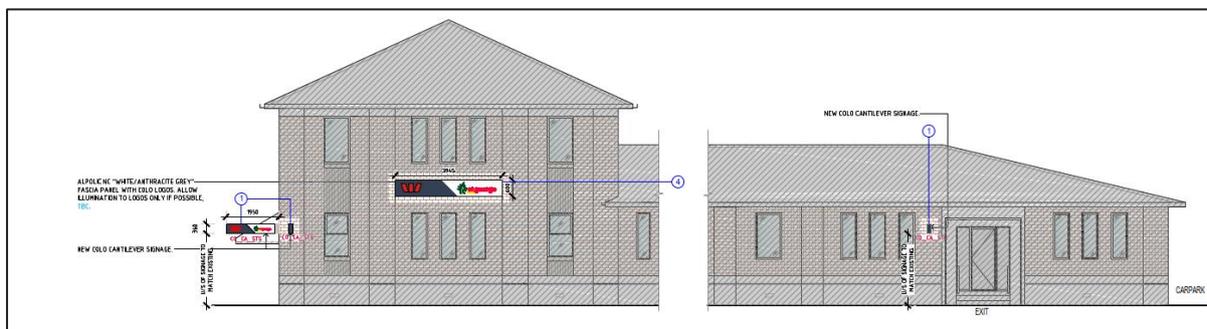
Proposed External Elevation, Kooyoo Street (Source: Architectural Plans)
